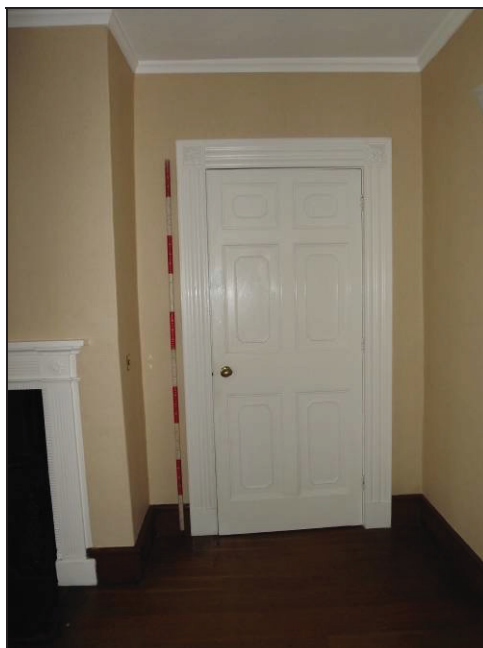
Detail of panelled door to Room 2, west wall of Room 1 (Scale = 2m)
